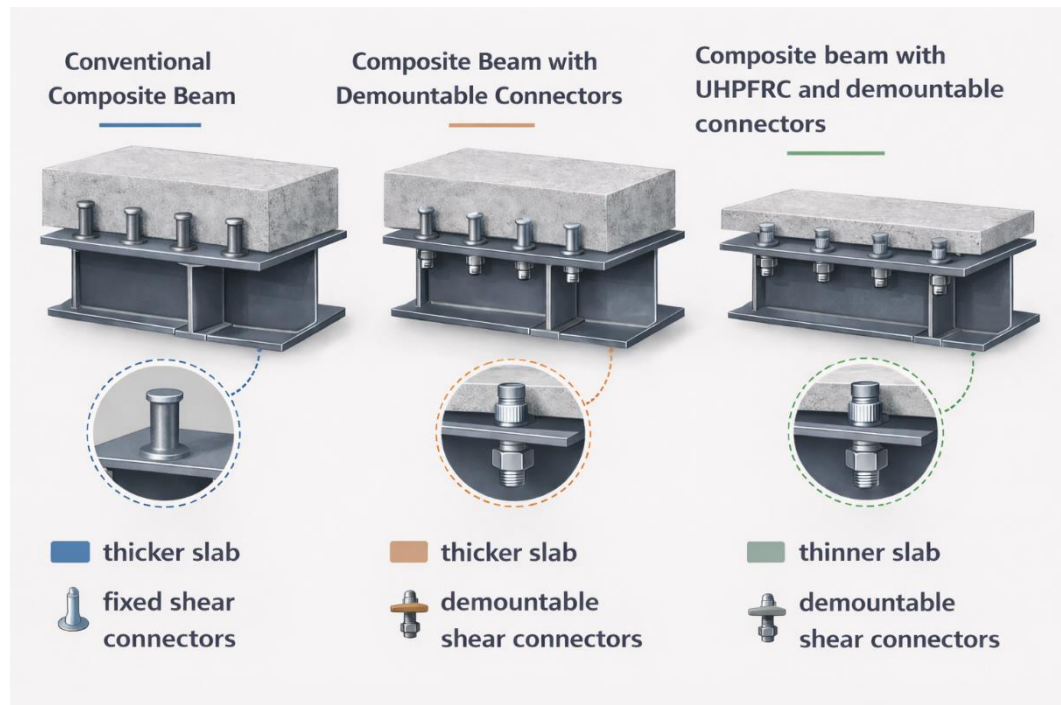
Comparison of conventional composite beam with reinforced concrete slab and composite beam with UHPFRC slab (created by author).
